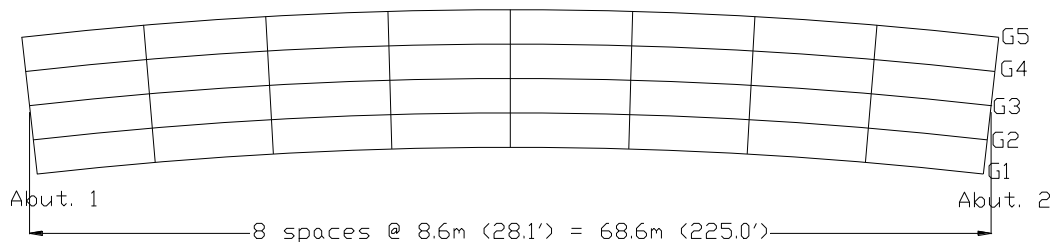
Stage 3 of Construction for Paired Girder (Inner Girders Placed First) Erection of Single-Span, 5-Girder, 305-m (1000-ft) Radius Bridge.
